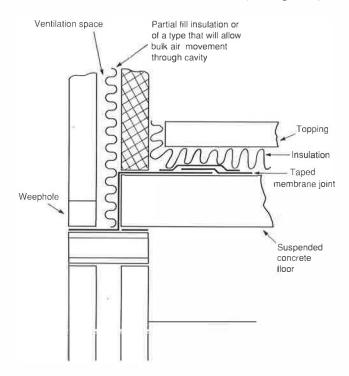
Avoidance of a slip plane within the wall by positioning the membrane joint over the floor
